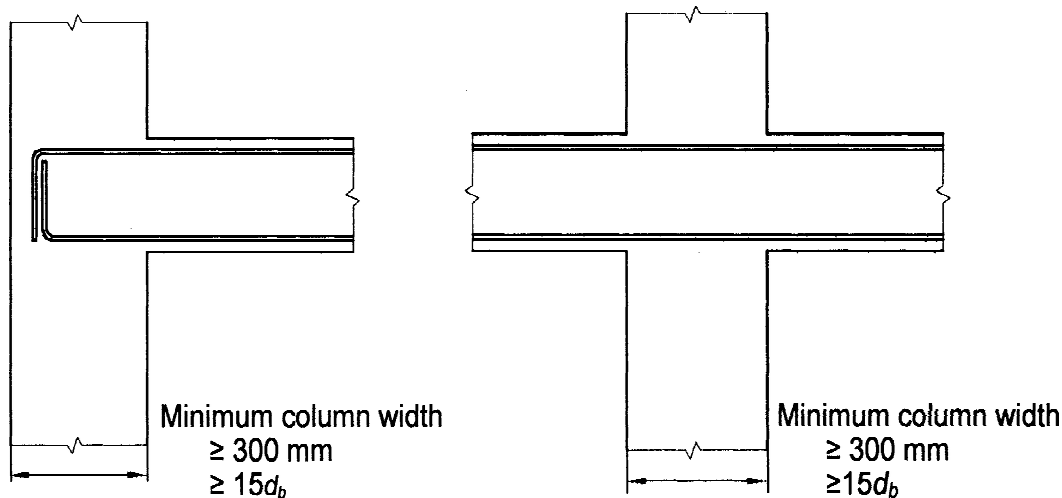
MINIMUM SIZE OF RC COLUMNS BASED ON DIAMETER OF LARGEST LONGITUDINAL REINFORCEMENT BAR IN BEAMS FRAMING INTO IT
